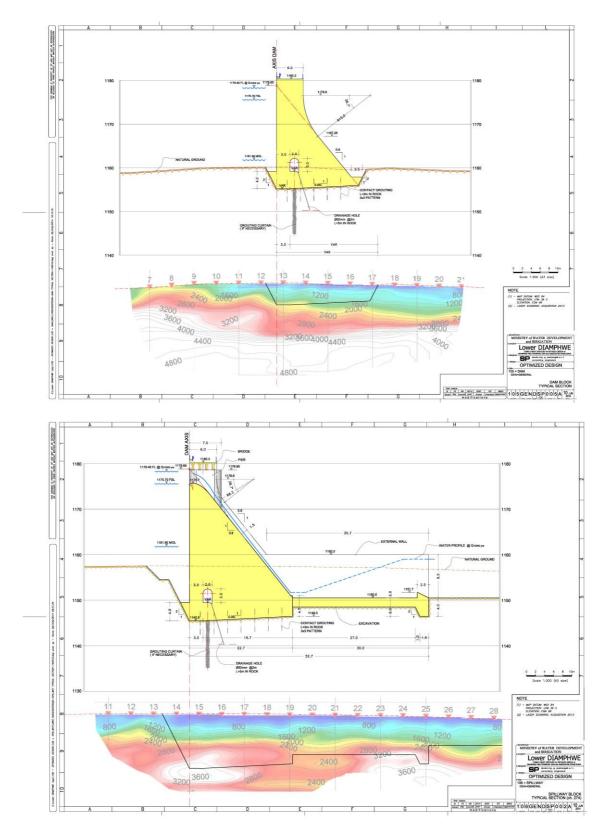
Dam Wall & Spillway Cross Sections (Ref. SP 2015)
